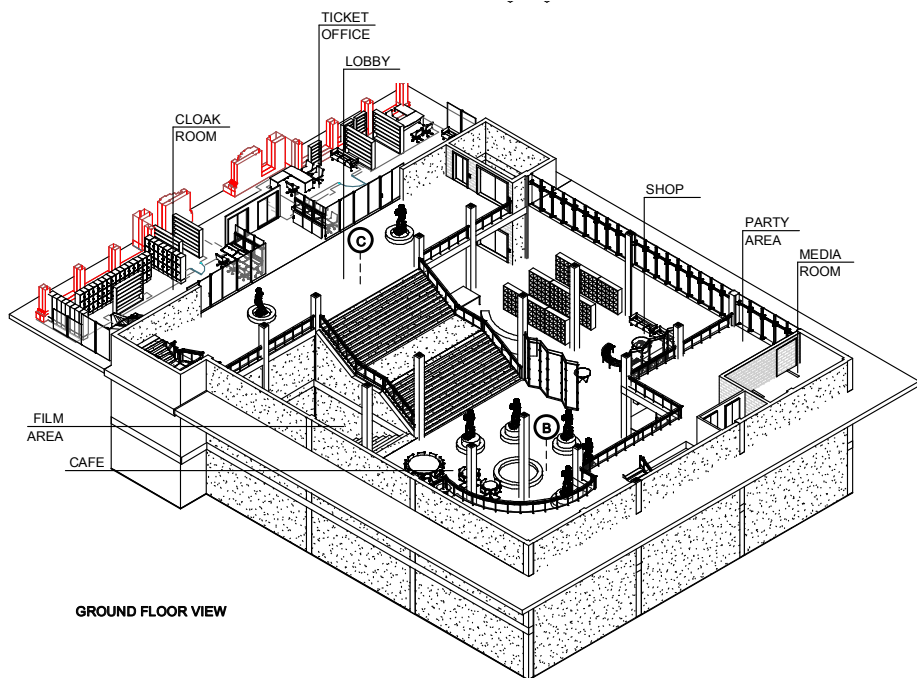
LAKSHMI BUILDING - AXNOMETRIC VIEW - GROUND FLOOR -
